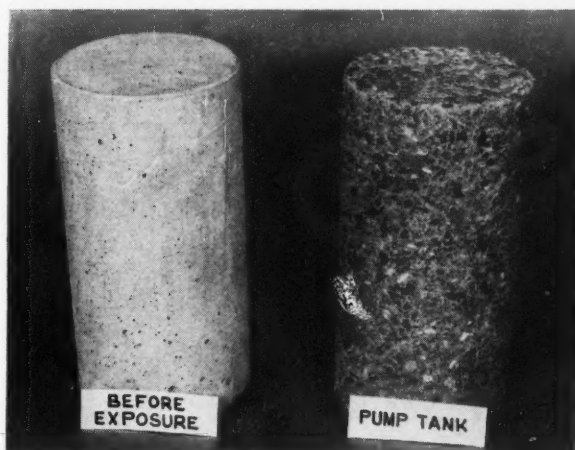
Concrete before and after exposure in pump tank. Note damage.
